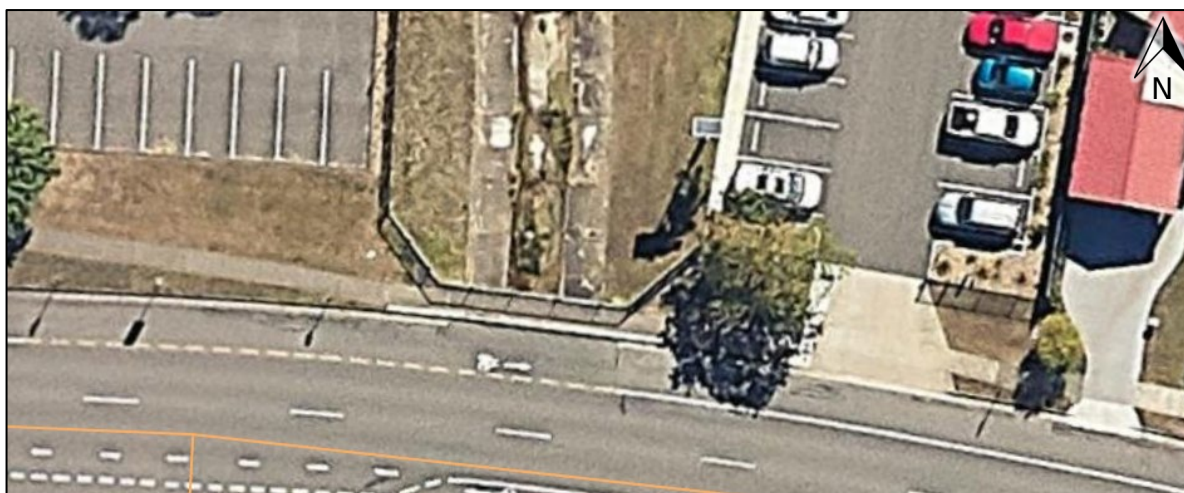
Existing Site access 2 arrangement (Source: Google Street view August 2022)
